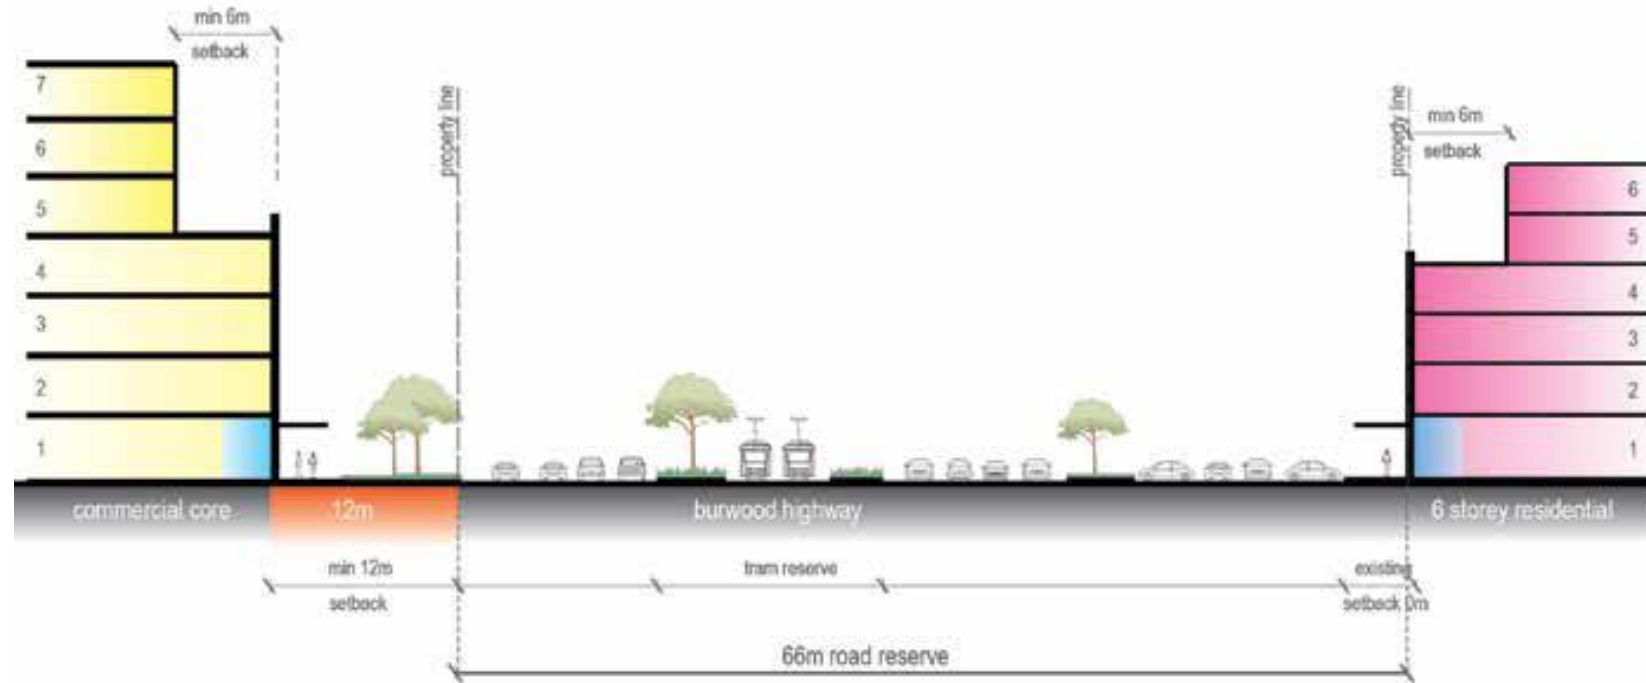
Section Diagram Commercial Core and Burwood Highway South Interface (Section c)
